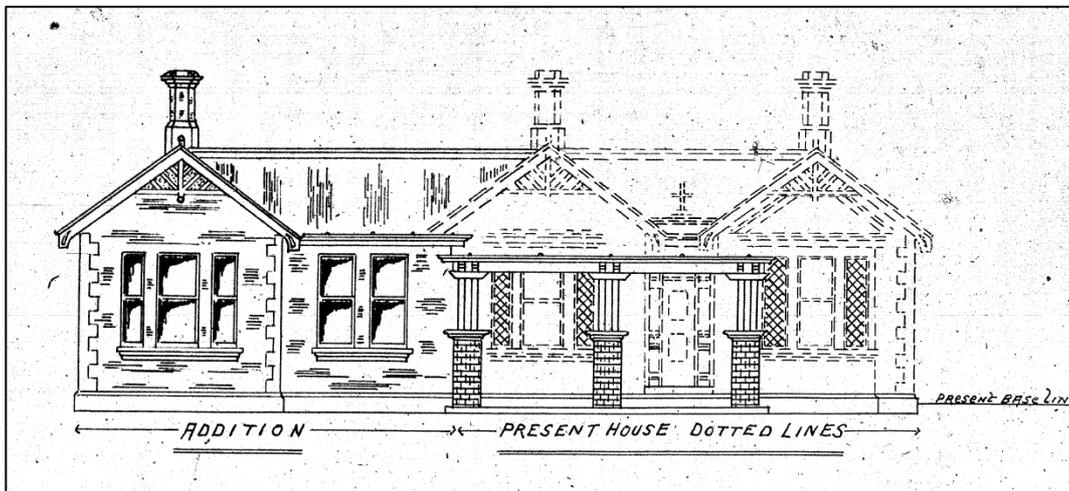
1929 Proposed addition, south elevation and original, Phase 1 design (Building Plans, DCC Archives).
